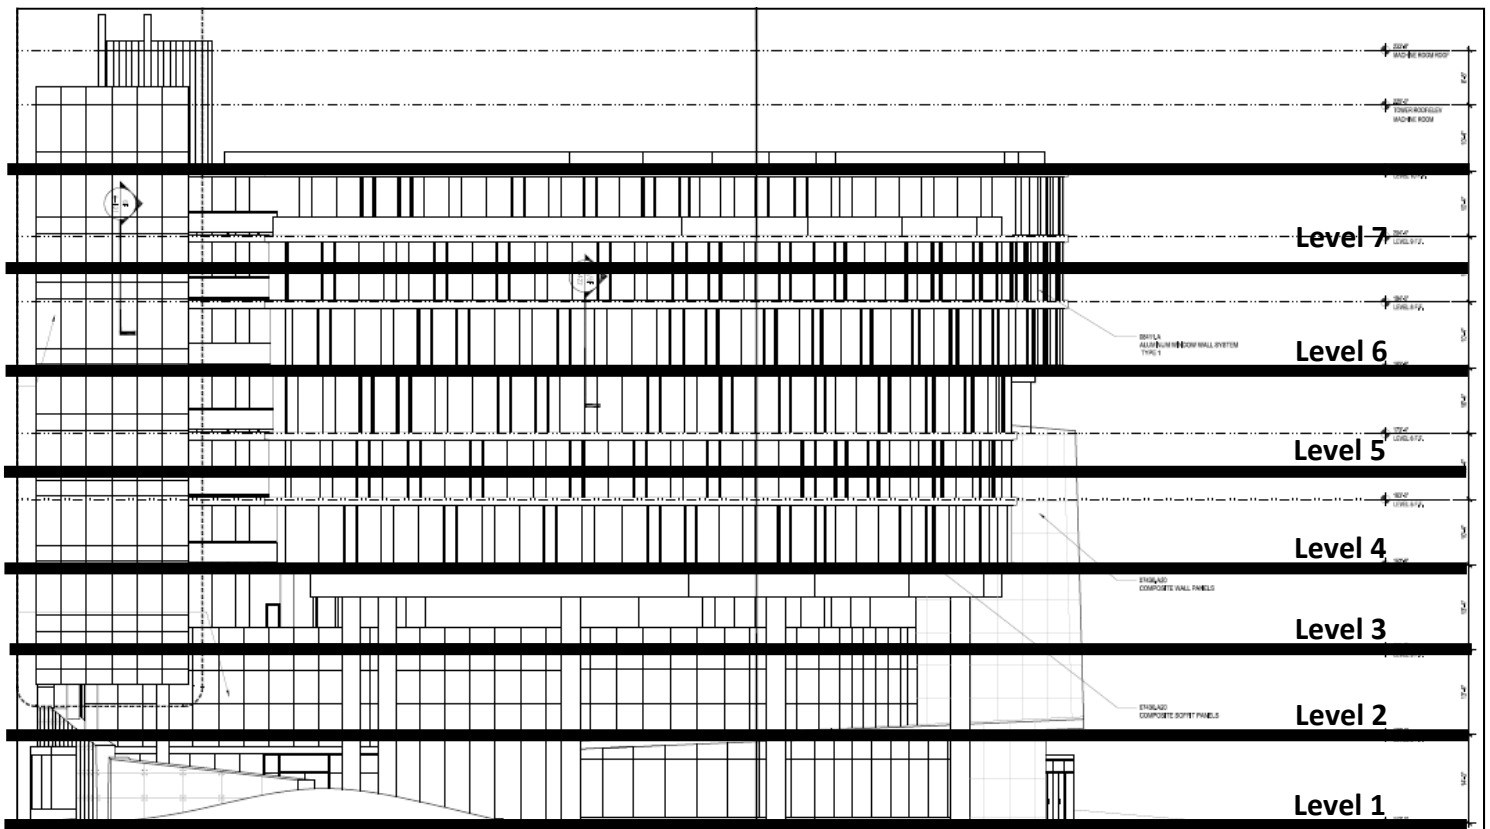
New level locations imposed on a building elevation. Courtesy of RTKL.
